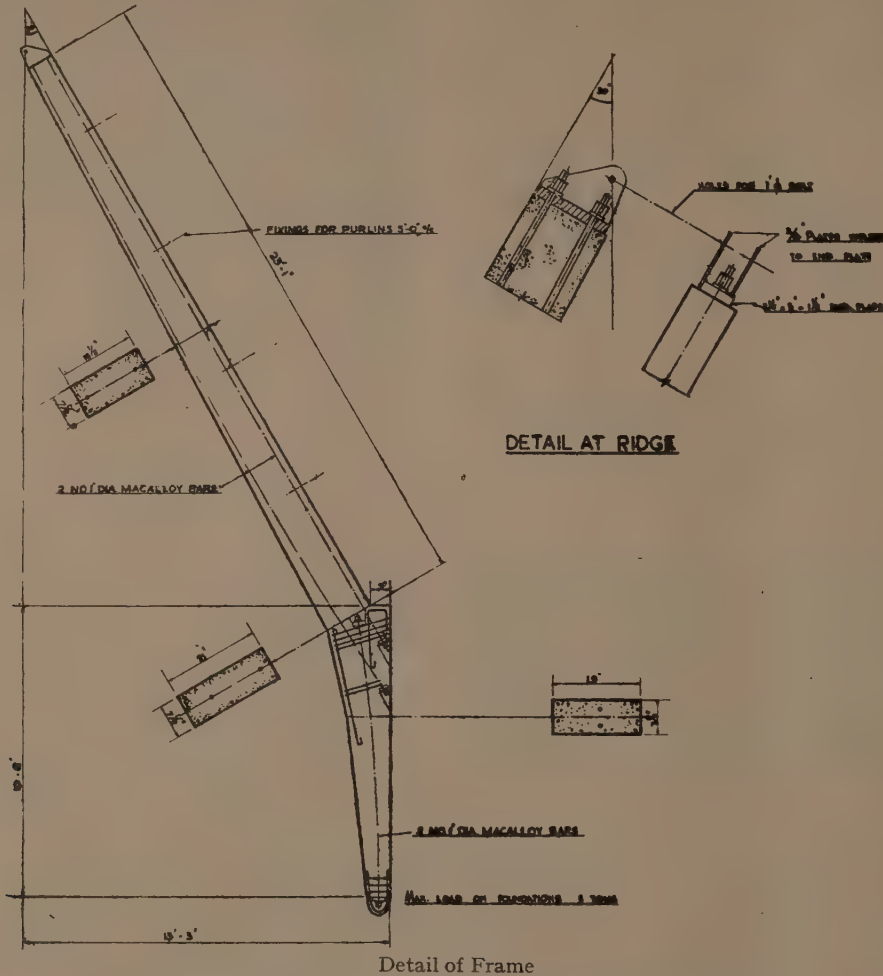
Detail of 3-hinged prestressed frames shown in Fig. 5
